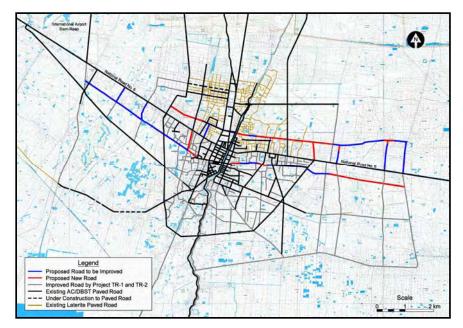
TR-3 Construction of Sub-arterial Road Parallel to the NR6
